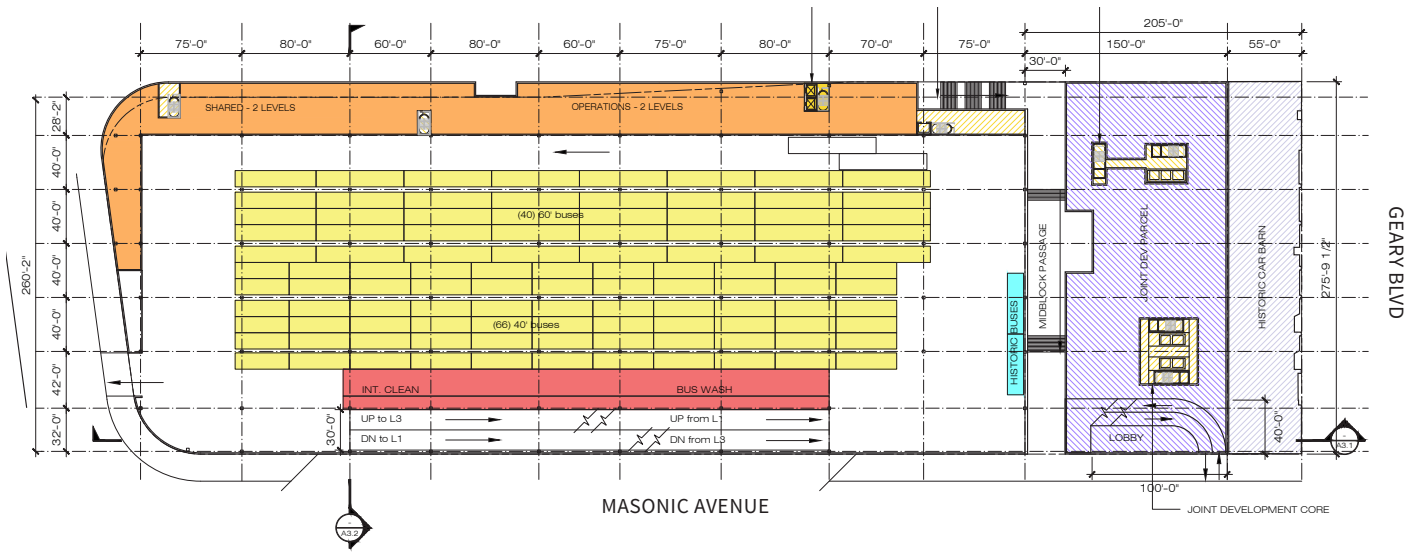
BUS FACILITY CONCEPT DESIGN - SECOND LEVEL PLAN
